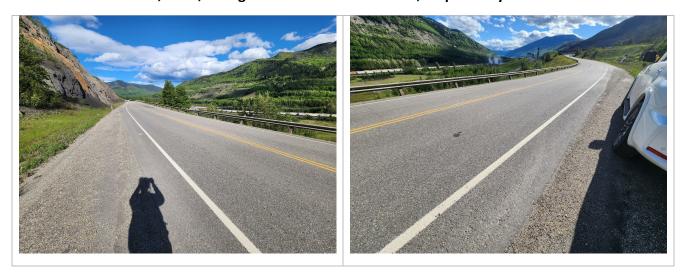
Slope on south side of Hwy 40:36 at west slide area. Photos taken June 10, 2024, facing southeast and southwest, respectively.
